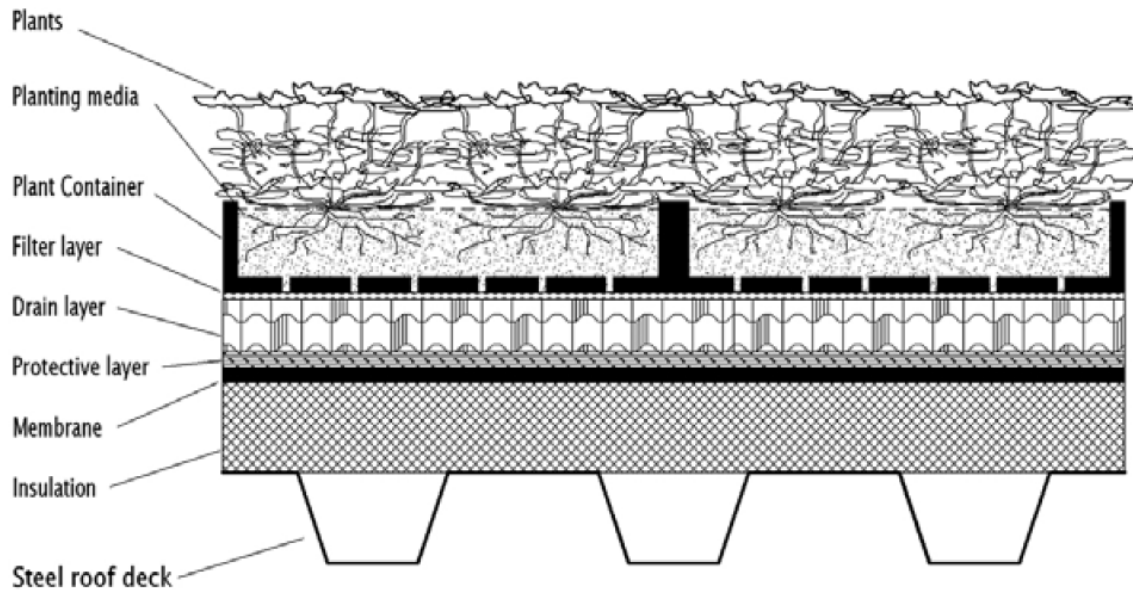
Extensive Green Roof Construction Cross Section. Source: Wark and Wark, 2003 (originally from SHADE Consulting, LLC, 2003)
